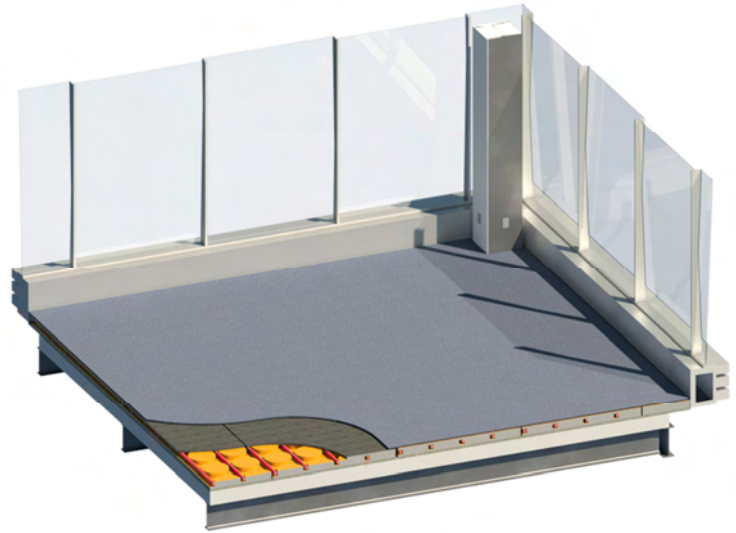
CUTAWAY SECTION OF RADIANT FLOORING
